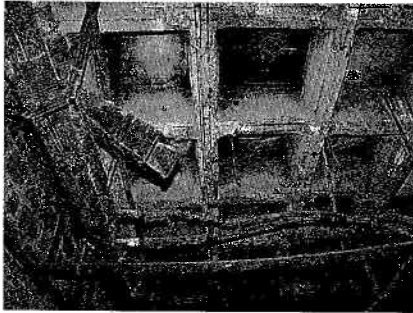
Spalling at underside of waffle slabs caused by fire damage.
